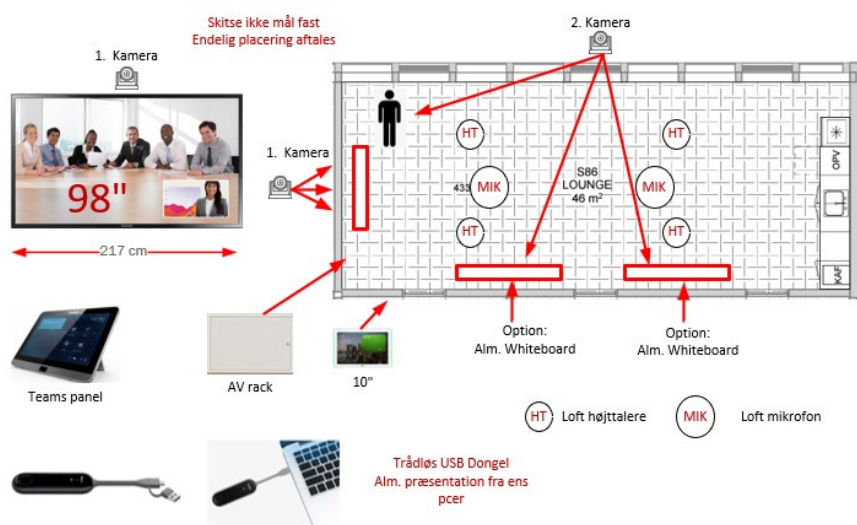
Planned layout of the lounge room. During refurbishment works, the lounge room was extended another 3 window sections, equivalent to 3,6 meters.
